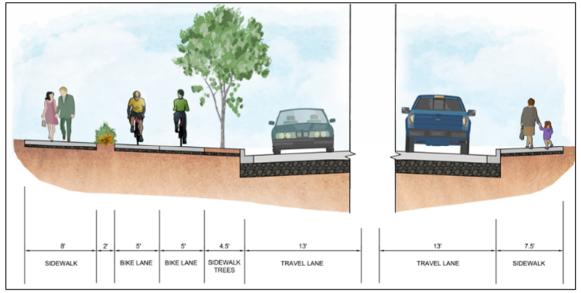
Bi-Directional Bikeway and Sidewalk Alternative (MM4).
